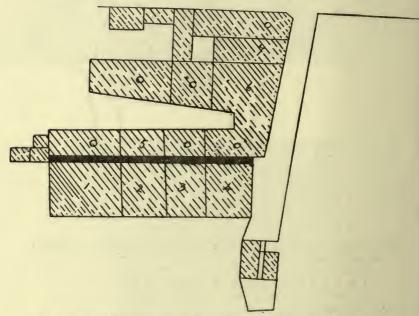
Plan showing congested area in a village not far from Exmoor.
